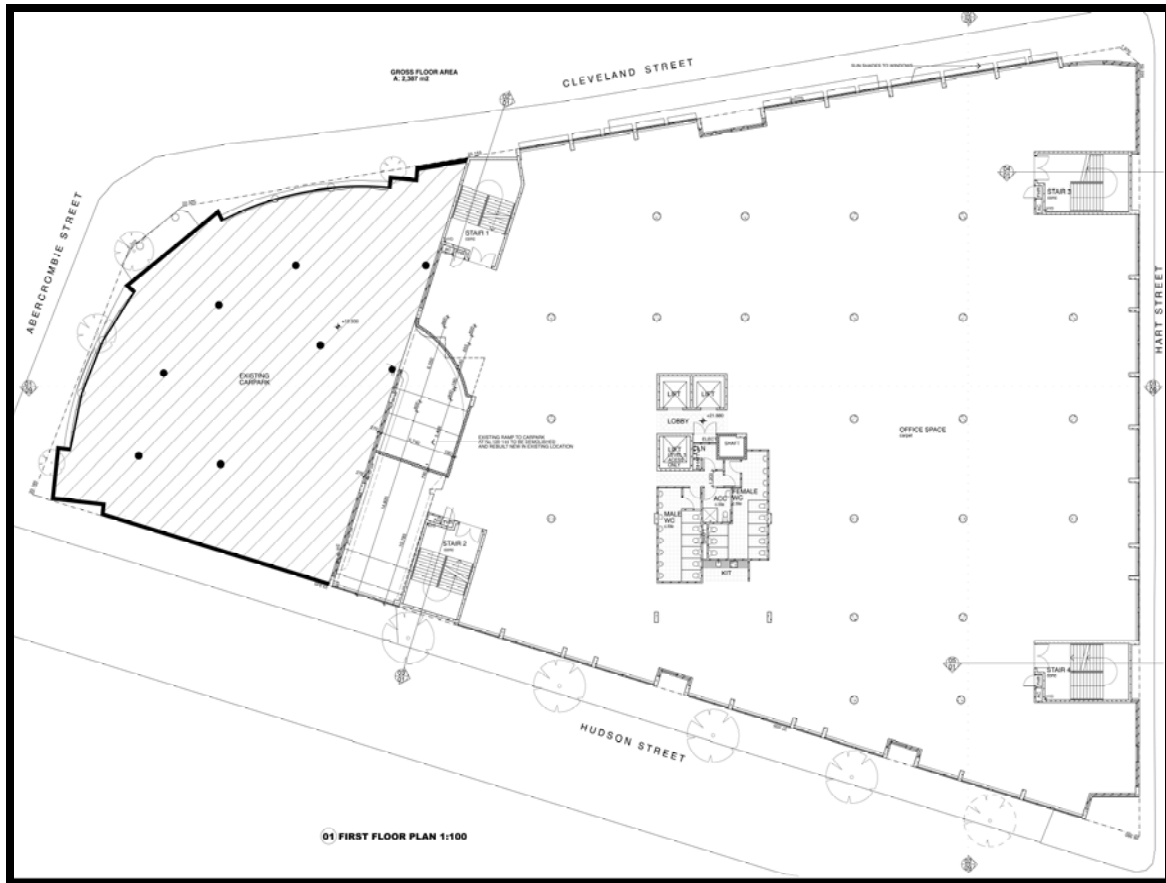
First floor plan of proposed development (not to scale). (Source: Fortey + Grant Architecture, 2010)
